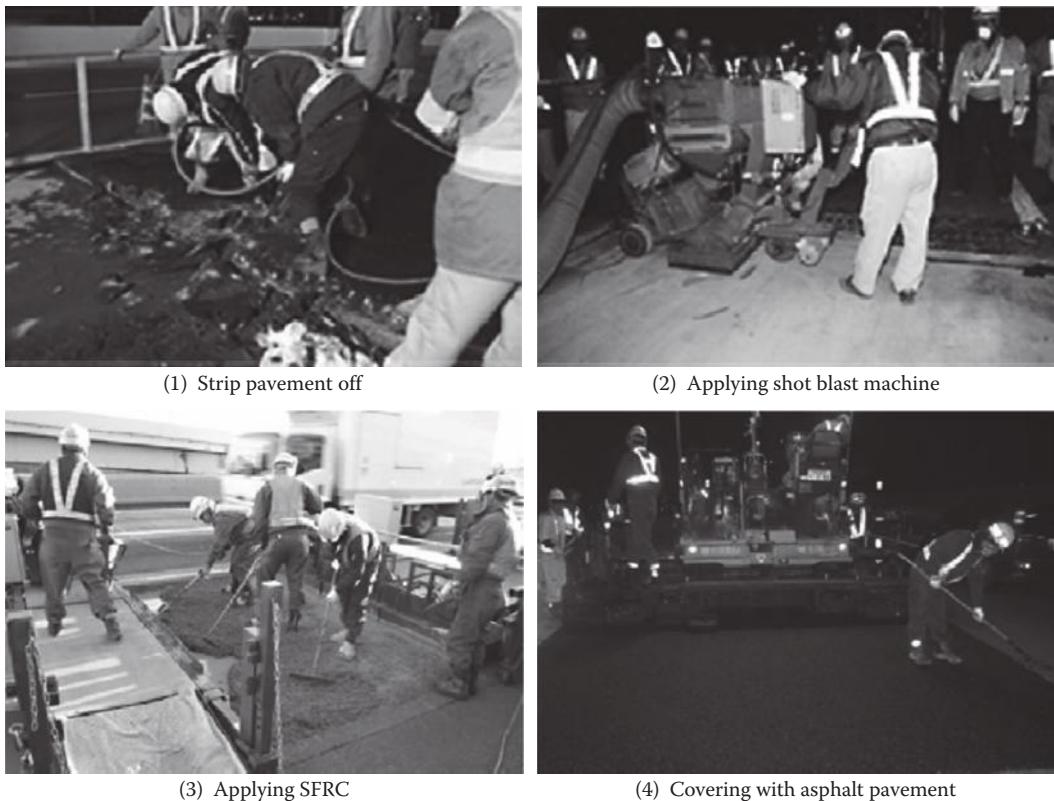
Retrofitting works by applying steel fiber reinforcement concrete.
